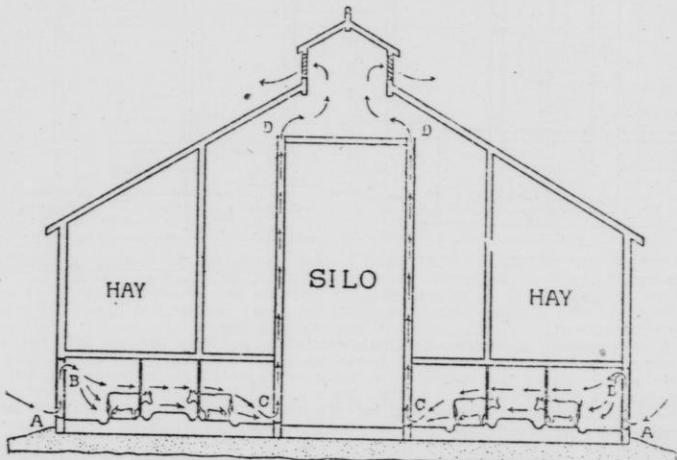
Represents the method of ventilating a barn where a silo or granary occupies the central portion. The air enters at A B and the ventilating flues are the spaces between the studding which form the walls of the silo, or other structure. The air entering at C in openings left all around the silo, and passing out at D at the top.
